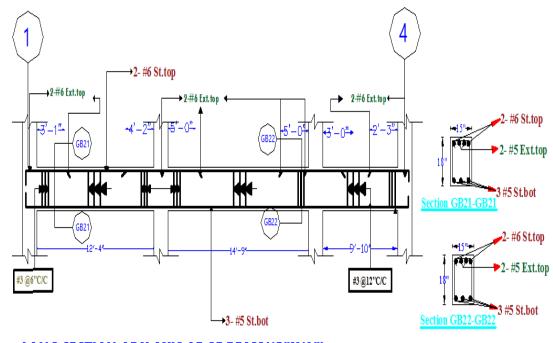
Reinforcement area of Grade Beam Y-Axis (in Inch Sq.)
